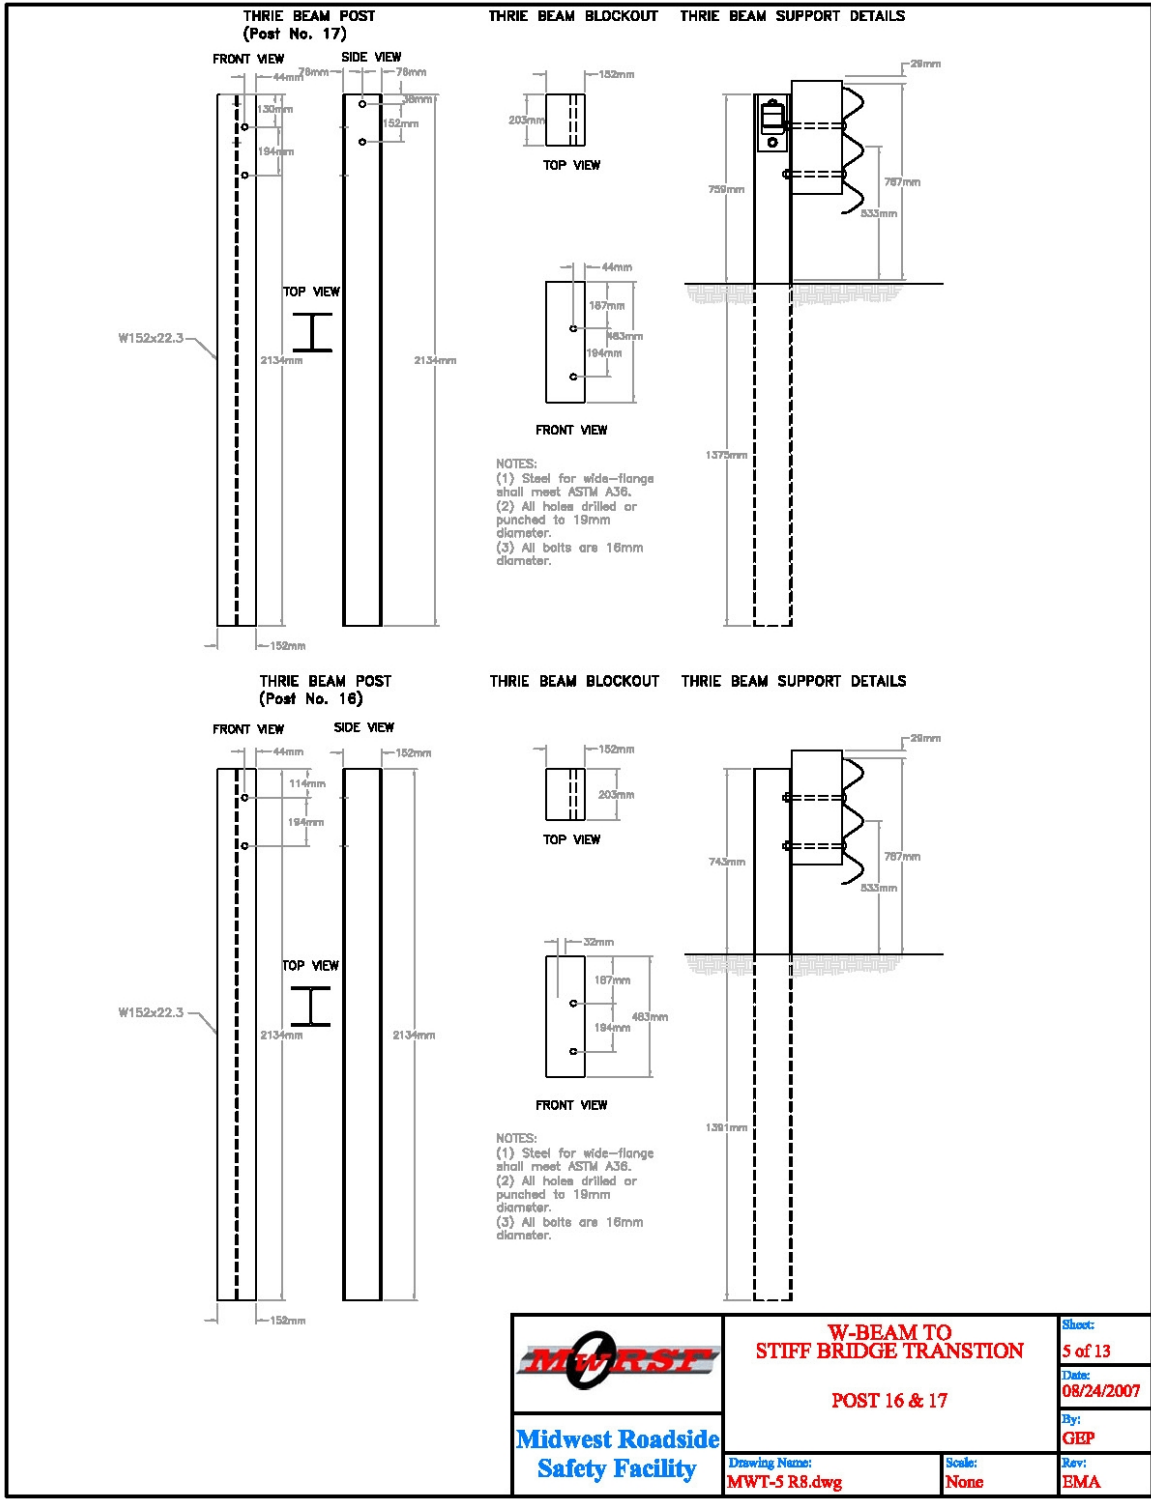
Post Nos. 16 and 17 Details (Design No. 3)
